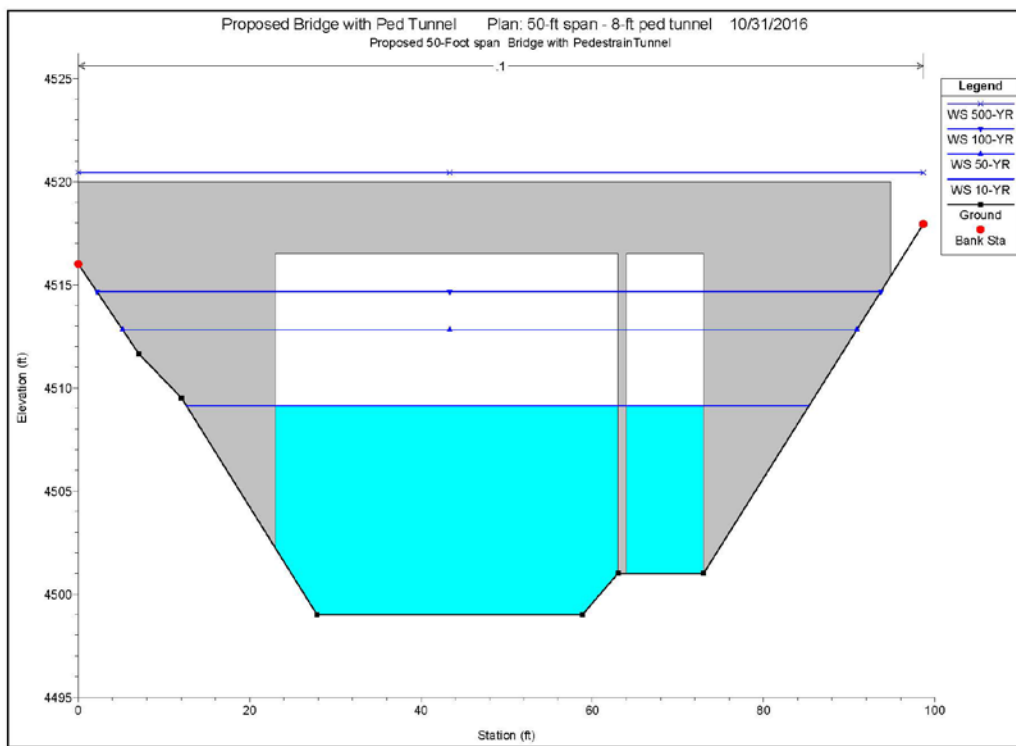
Cross-section at RS 4+00 of proposed bridge with shared use path tunnel using the existing abutment as the channel side tunnel wall. 100-year WSEL is 4514.67 and lower chord of the bridge deck is at 4516.5 for a freeboard of 1.83 feet.
